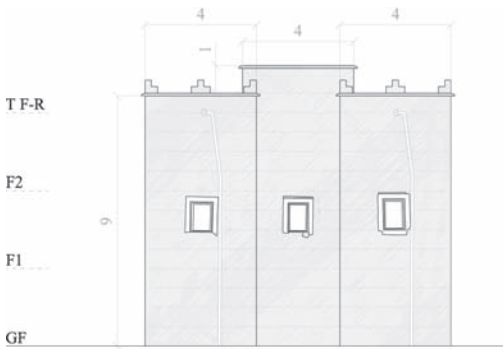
Elevation of the *tighremt* shown in Figure 12. Height is given in meters and in number of wall sections.
